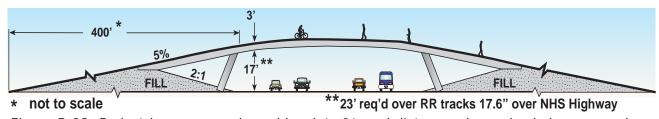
Pedestrian overcrossing adds a lot of travel distance when raised above a roadway
